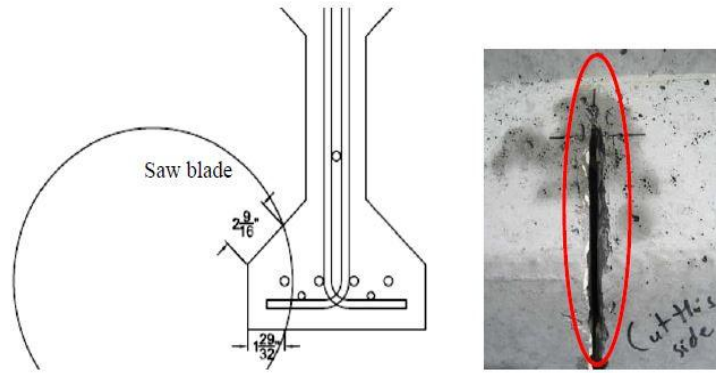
Damaged Girder (EISafty & Graeff, 2012)
